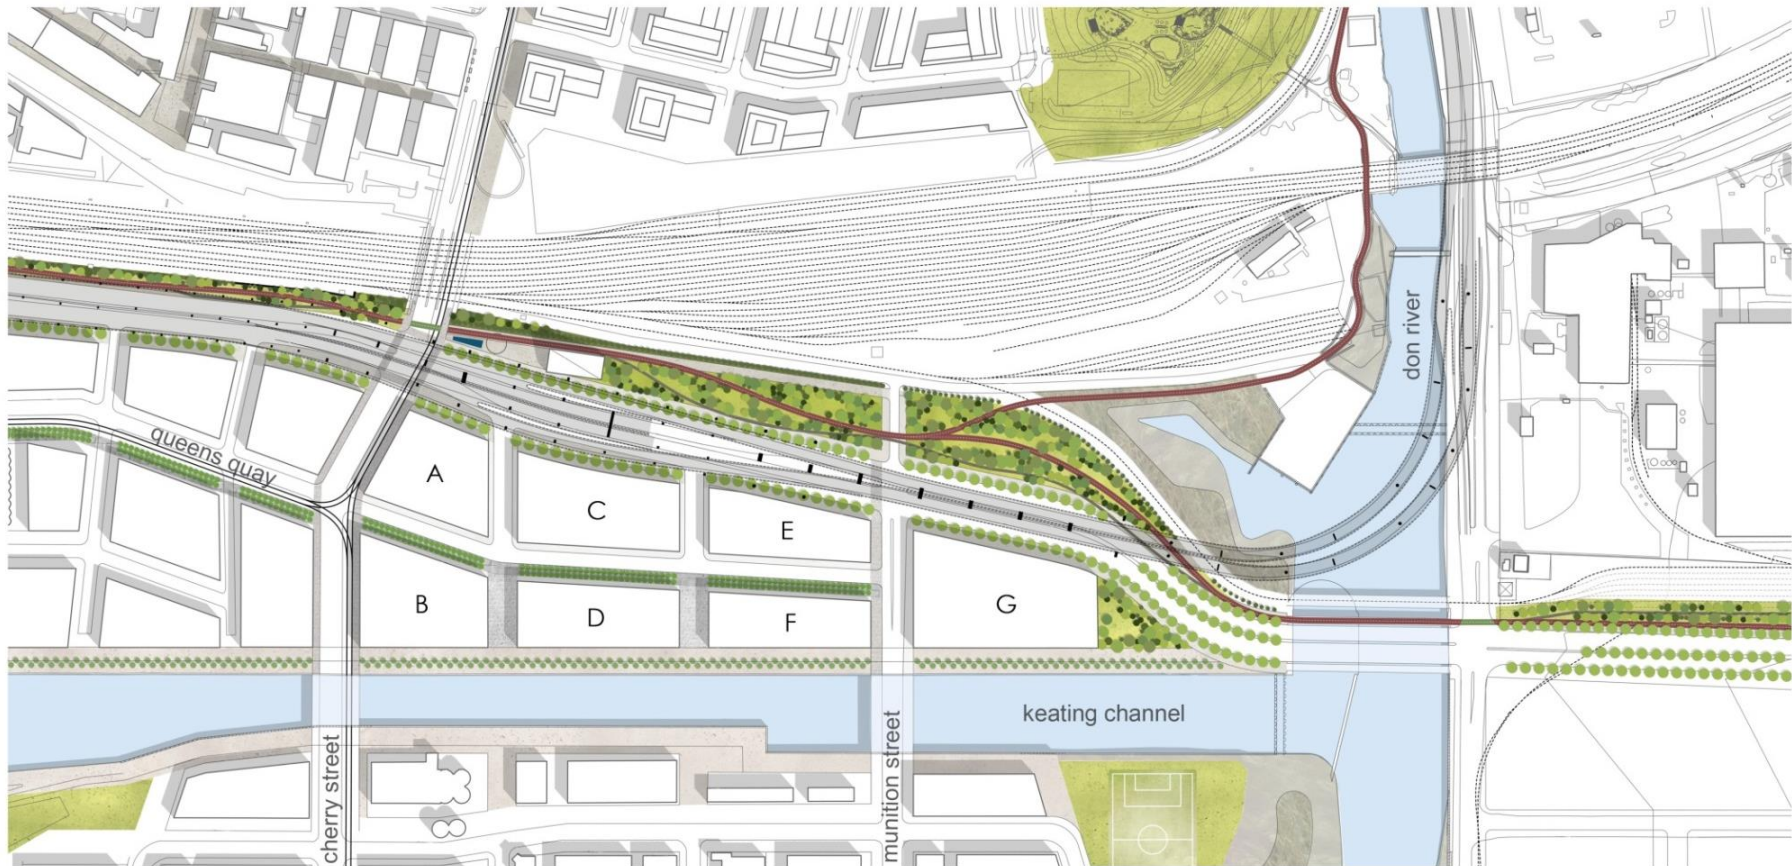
Hybrid Design Alternative 3 (North) – Urban Design Plan
